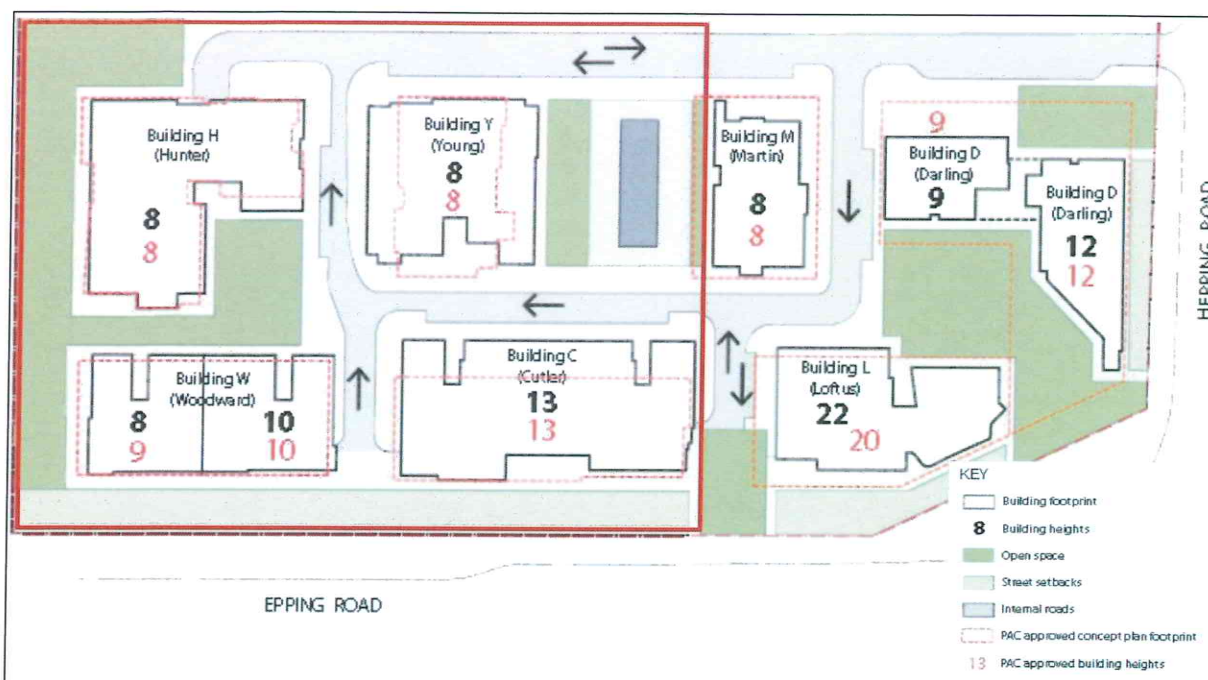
Approved Concept Plan layout (Stage 1 Project Approval shown in red outline)
